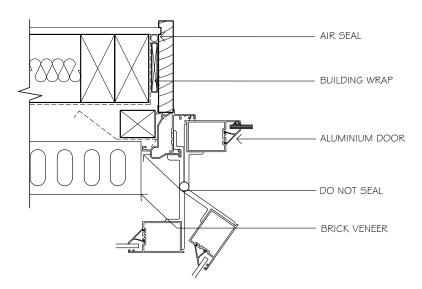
(D8) WINDOW HEAD DETAIL SCALE 1:5
